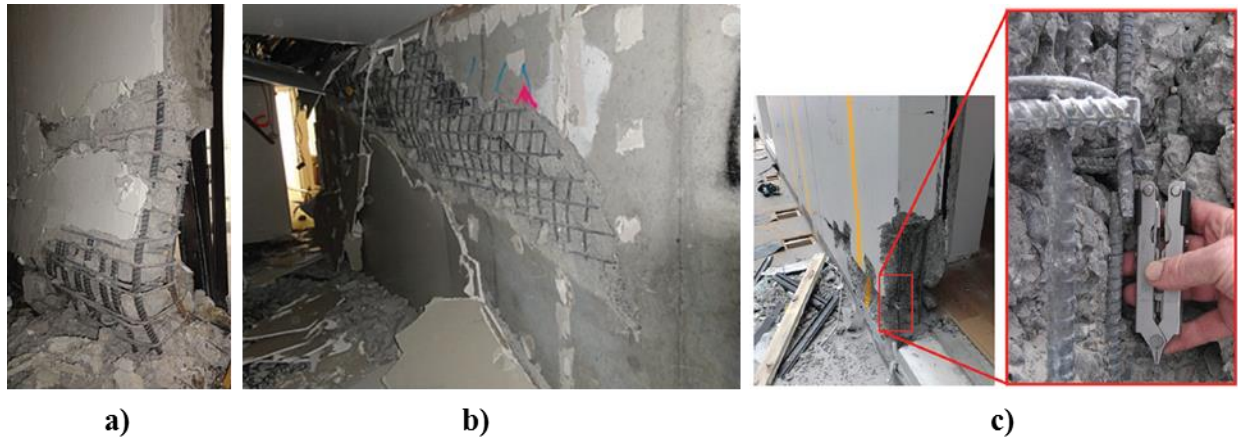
Observed damage to shear walls in Christchurch: a) Lateral (out-of-plane) instability, b) Web crushing, and c) Reinforcement fracture, Images: Elwood et al. (2013)
